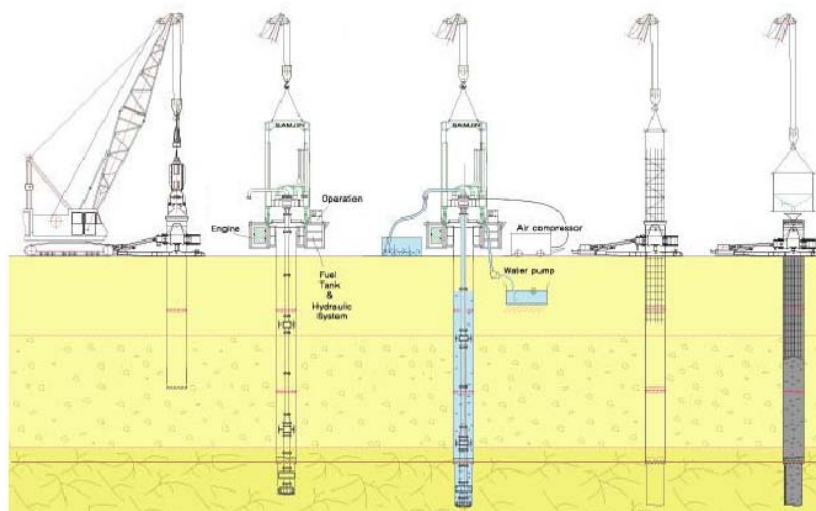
Steps for Cast in Situ Pile Construction on the Land Portion
